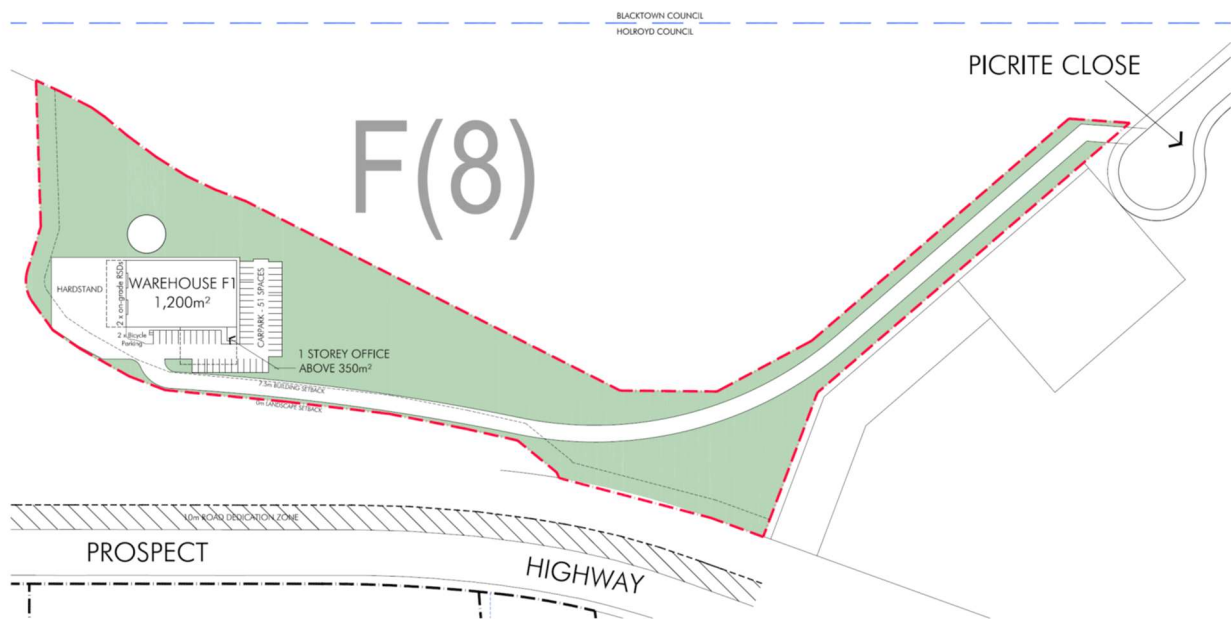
Precinct F Site Plan – As Currently Approved (Source: Nettleton Tribe)
